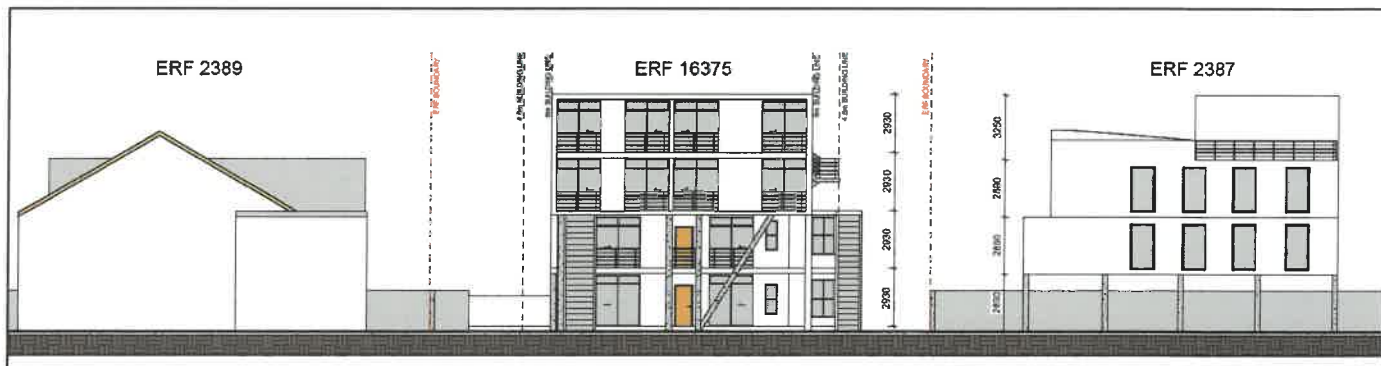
Visual Impact of Streetscape on Banghoek Road
